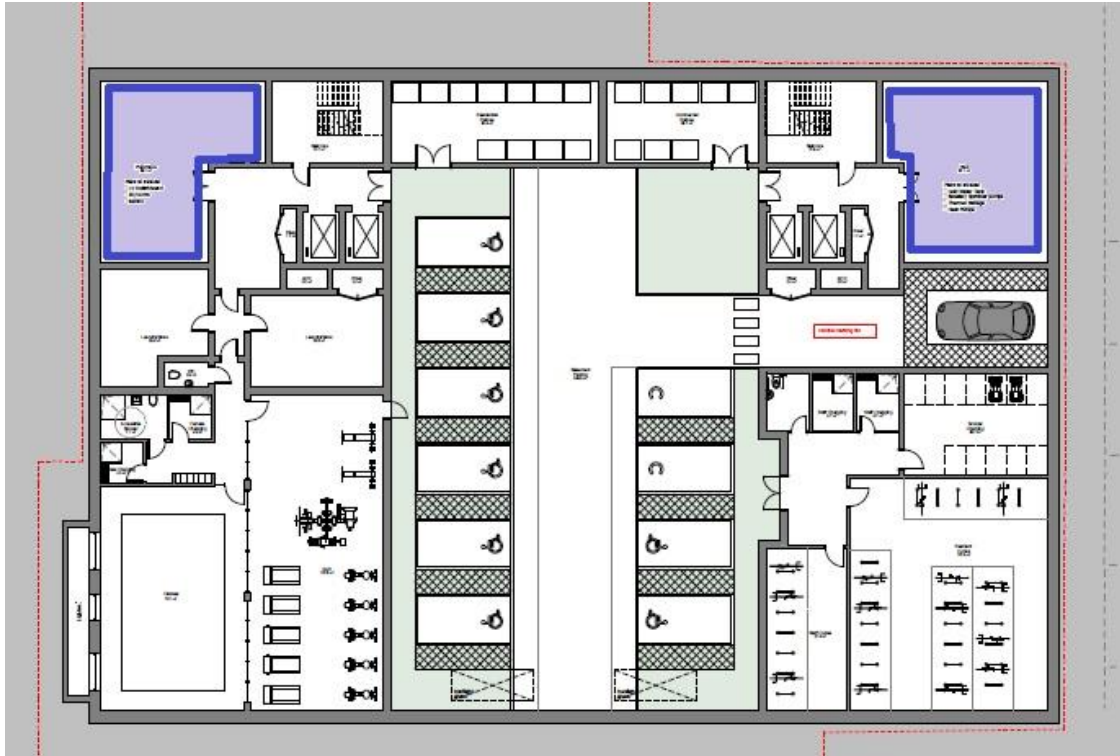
Location of basement plant rooms (based on drawing by Barton Willmore)
